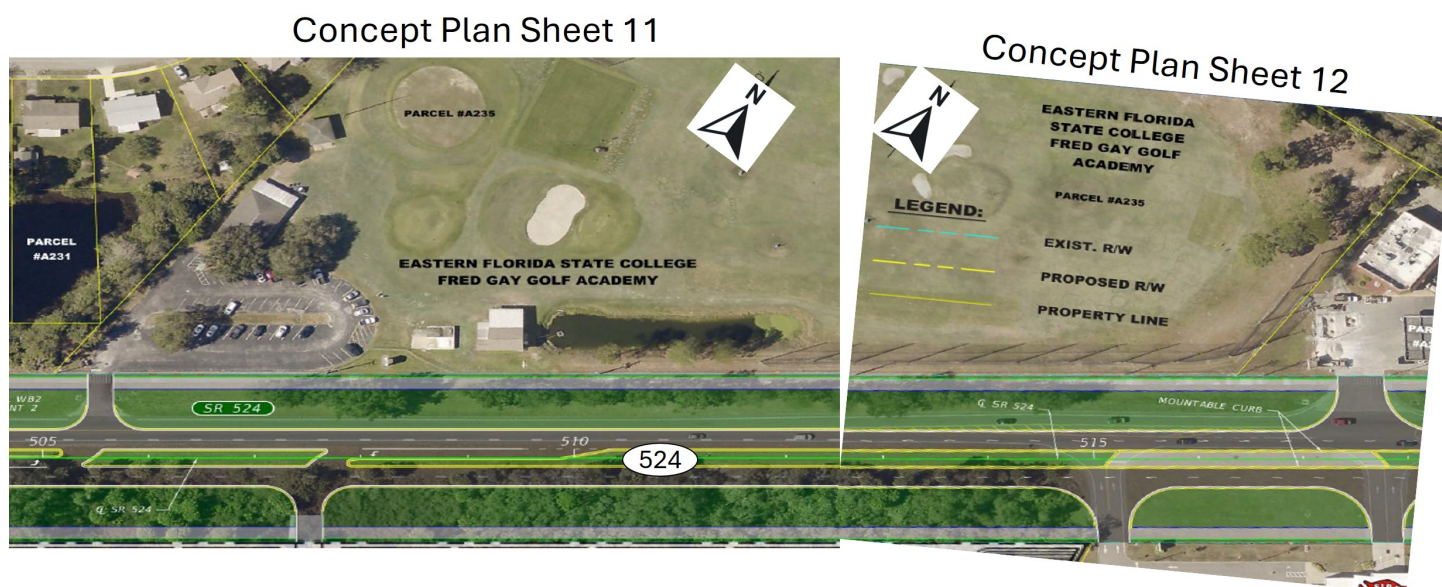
Concept Plans Showing Project Improvements Adjacent to Golf Academy
